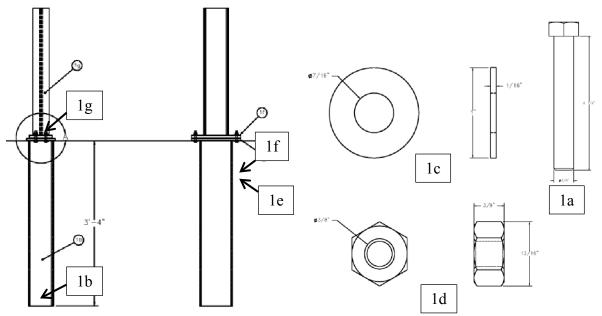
Fracturing Bolt Steel Post Design (13).
